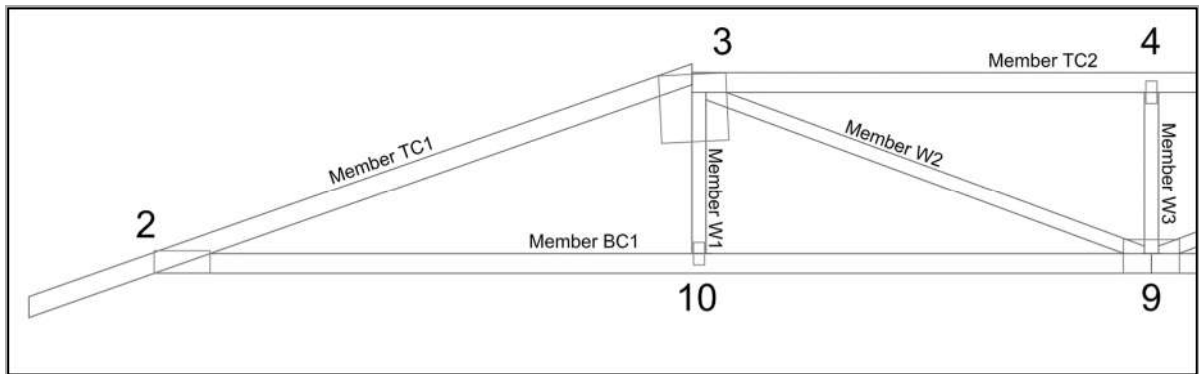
Half of modeled hip roof truss with MPC joints and members labeled according to truss manufacturer’s drawing package
